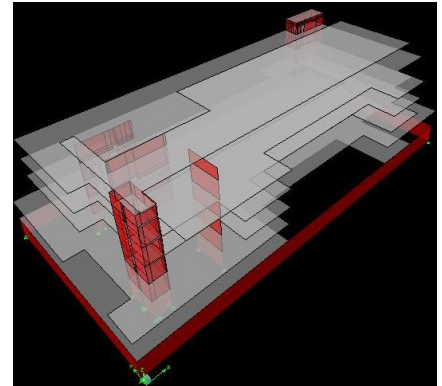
ETABS Modified Special Reinforced Shear Wall Design
